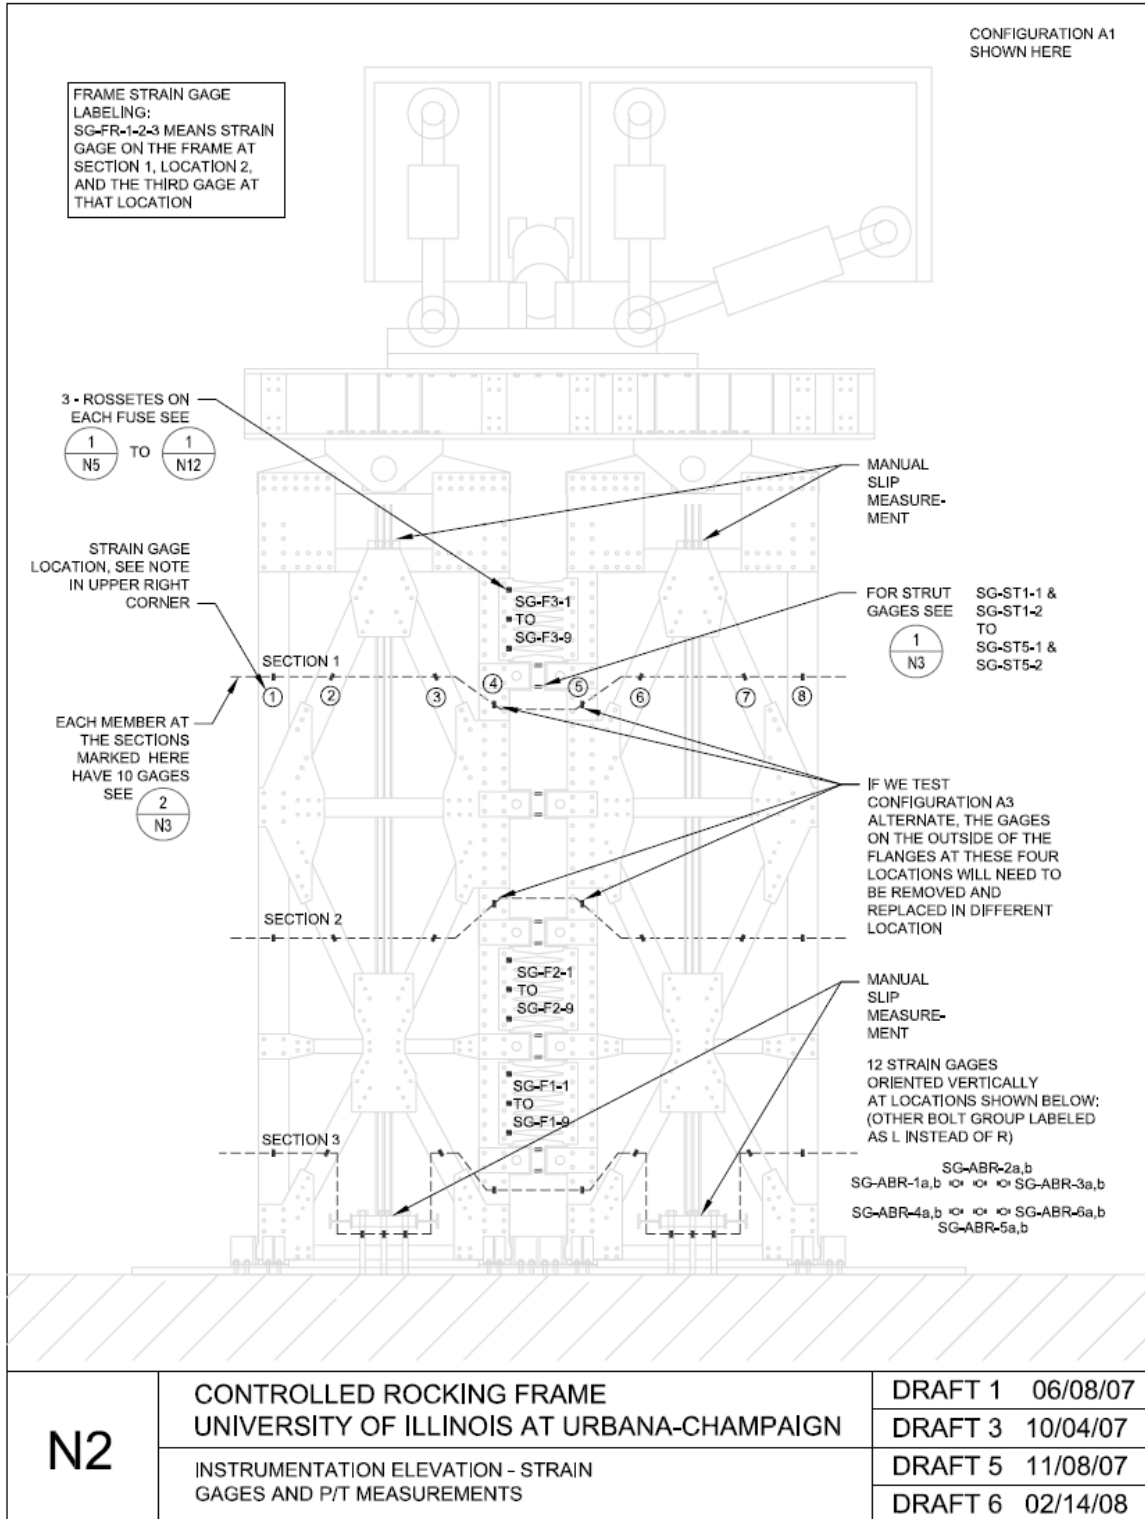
Instrumentation Plan Drawing – Strain Gage Plan
